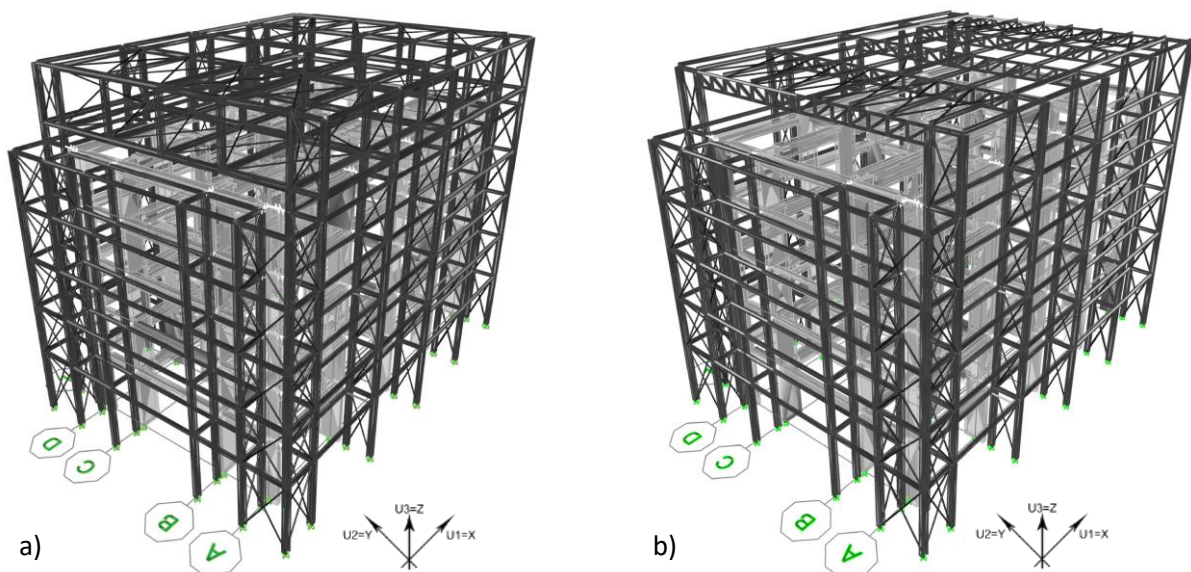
Panoramic view of the finite element model of the application of the exoskeleton with roof-extensions on the north part of the Athens case study; a) Vierendeel beam; b) truss beam
